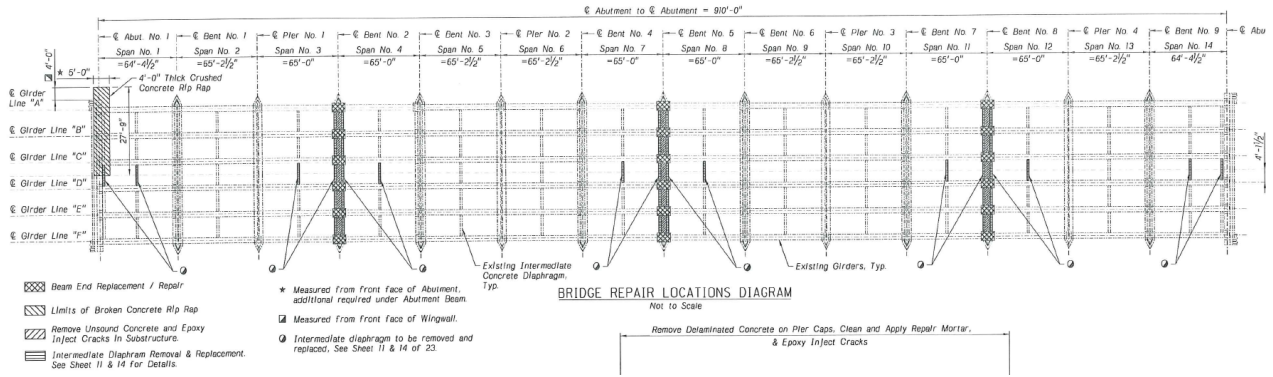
Girder spans and location of repair works, from the repair documents of Kearney South Platte River Bridge, courtesy of NDOT
